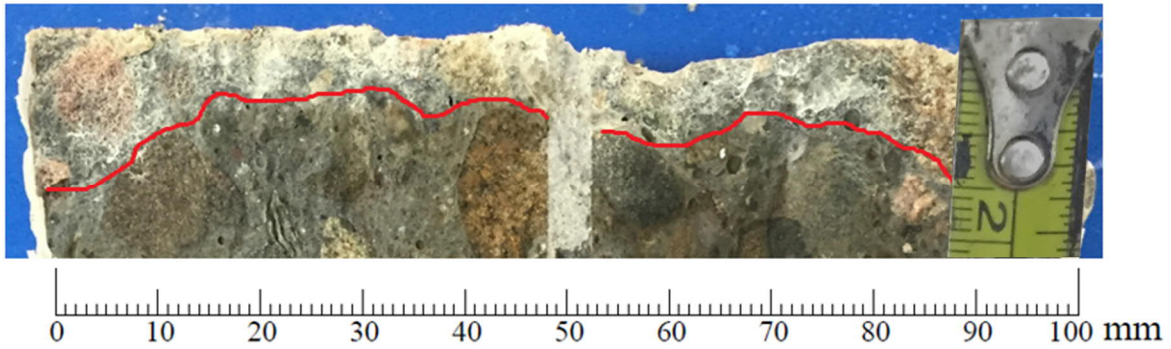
Typical shape of chloride ingress through hard-hard concrete bond
